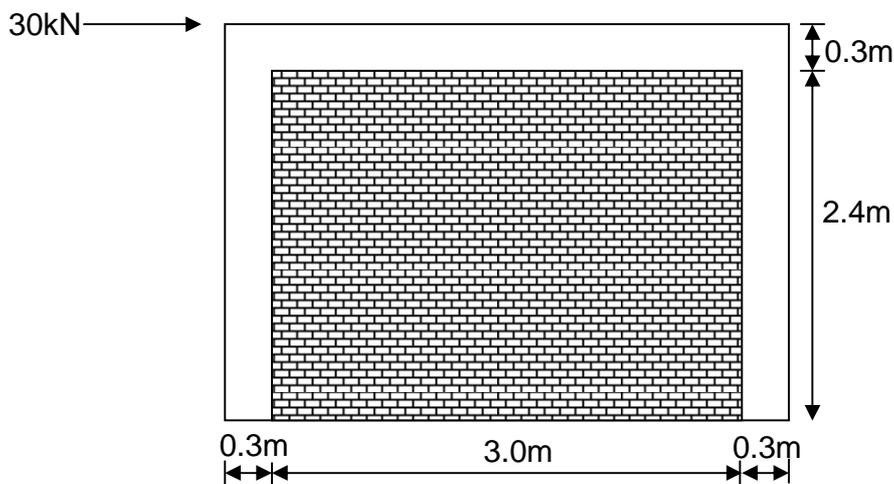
Infilled reinforced concrete frame structure under the action of a static horizontal load
